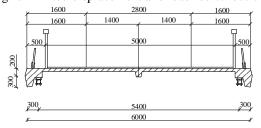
Cross section of the bridge (all dimensions are in millimetres)
